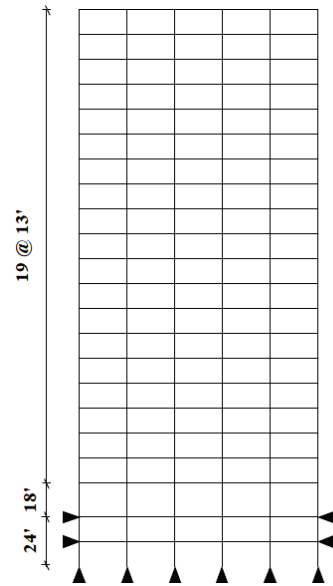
Baseline SDC D_{max} steel moment frame building typical 20-story elevation.
